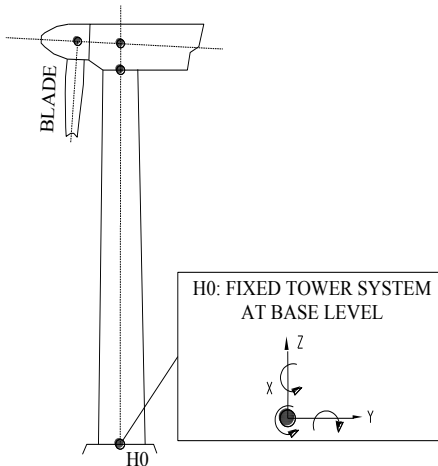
Wind mast indicating the location of the tower bottom forces considered for foundation design
